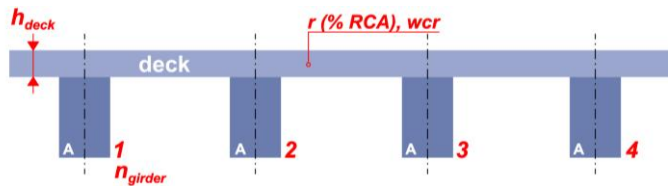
Design of bridge in transverse direction (cross-section) and design variables
